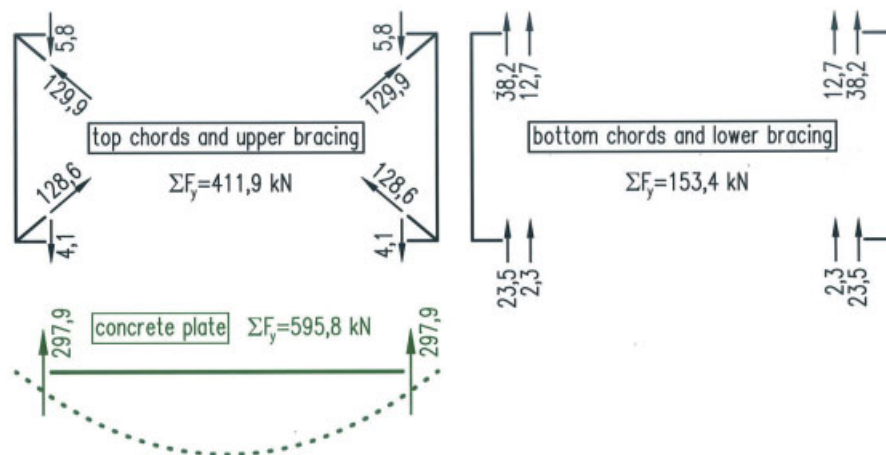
Absorption of wind forces (deck construction comprising the concrete plate)
